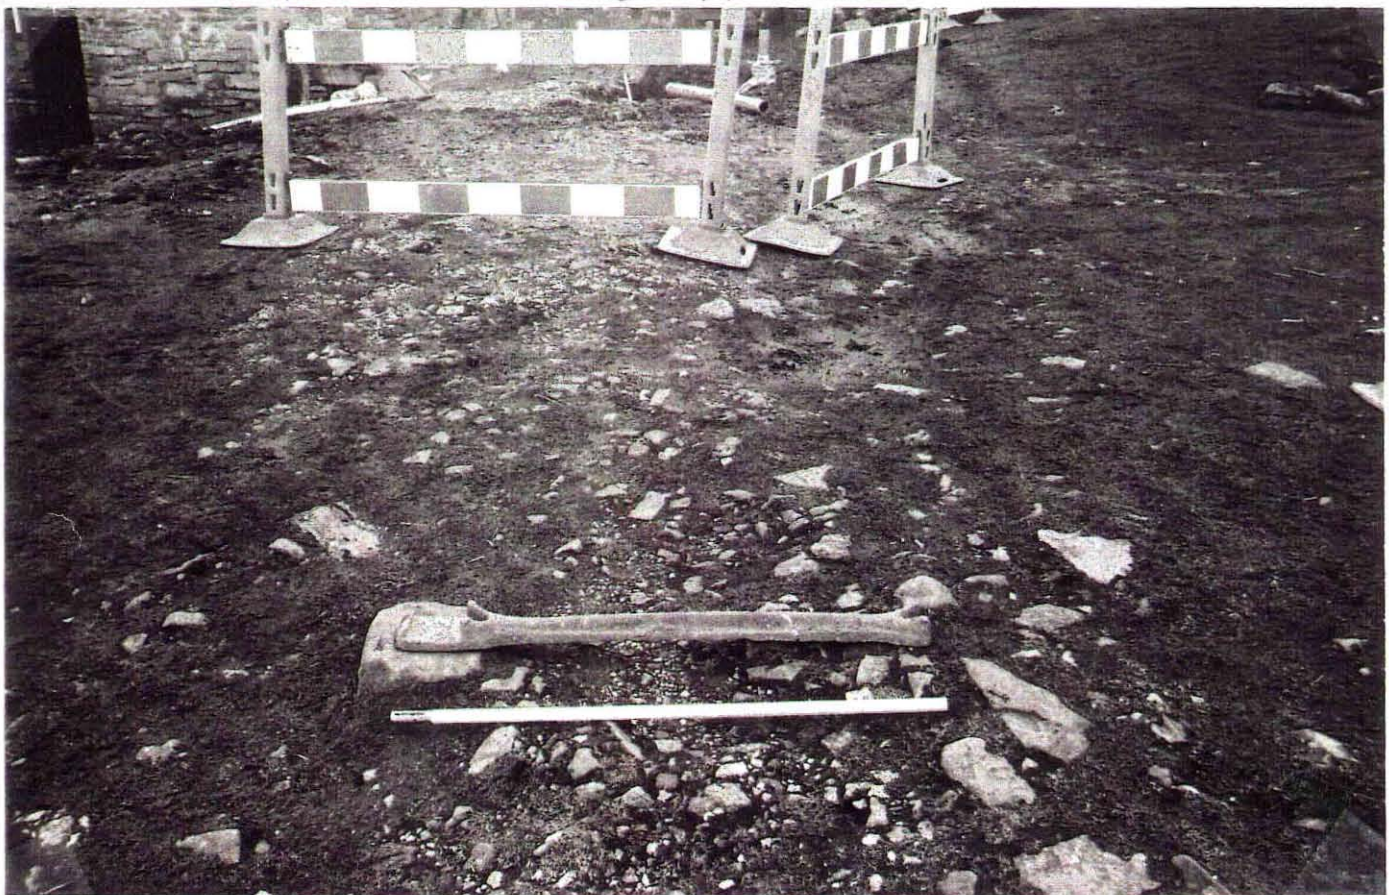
Reconstruction showing cast-iron tie-bar sleeper and stone blocks
